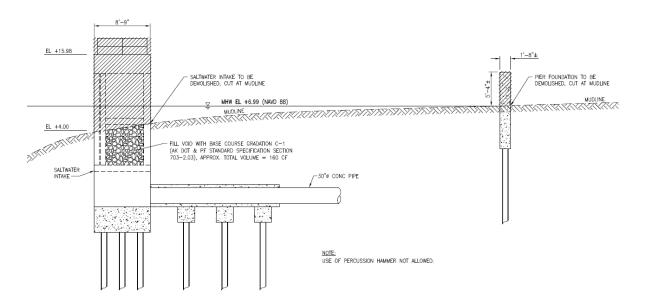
Existing Seawater Intake Structures and Proposed Demolition Plan (from Sheet C304 of August 2020 Plan Set by Reid Middleton)
